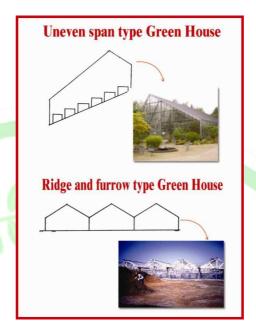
Uneven and Ridge and furrow type greenhouses
